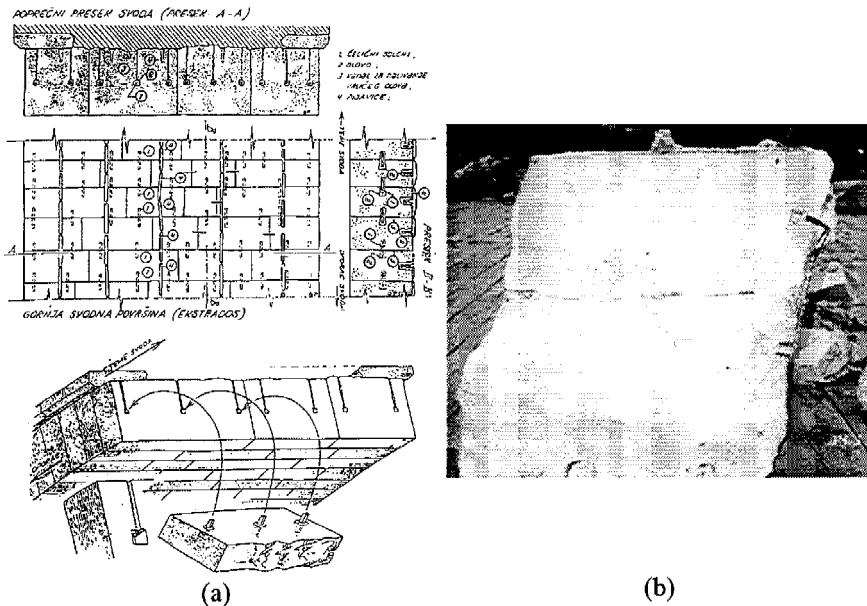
(a) Scheme of voussoir connections from [2]; (b) photo of two stone blocks with dowels and cramps.
